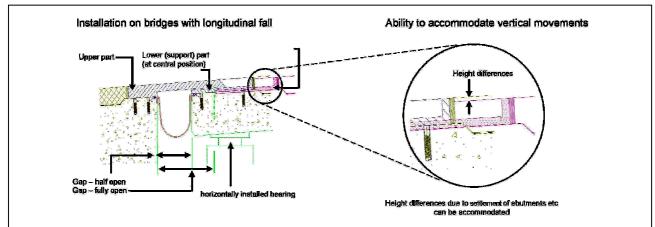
Installation on bridges with longitudinal gradient and horizontal sliding bearings
